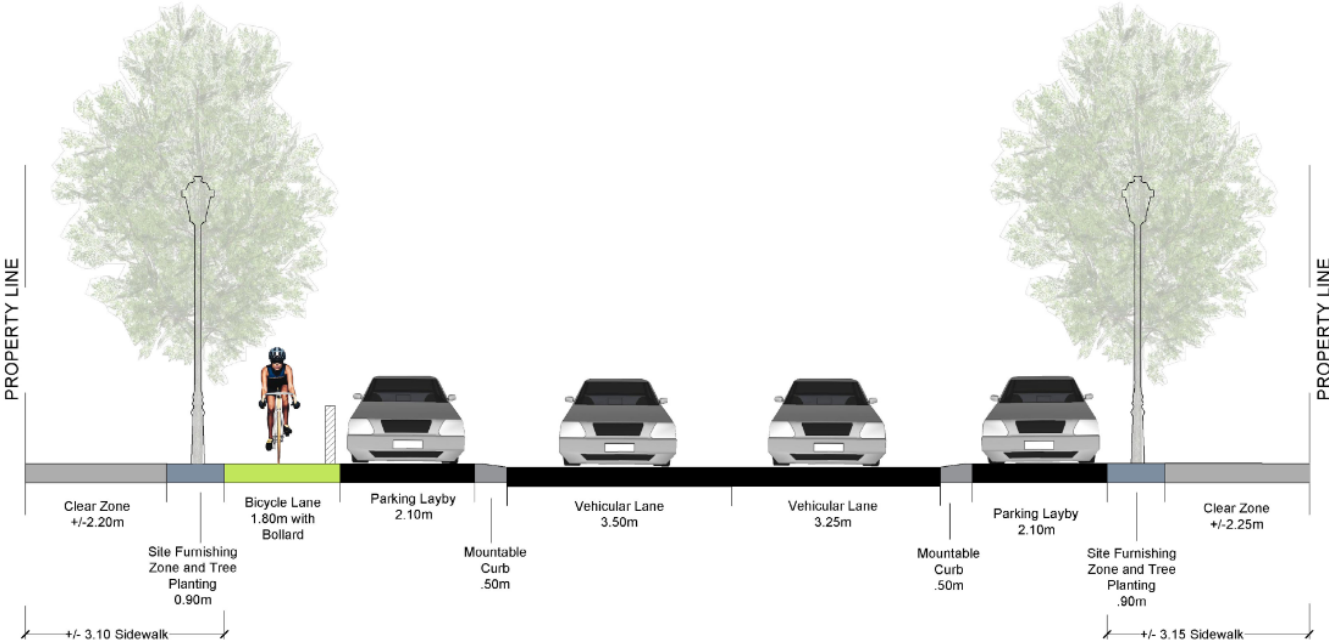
Preferred Alternative (Cross-Section) - One-Way Traffic, Parking Both Sides, Bike Lane
